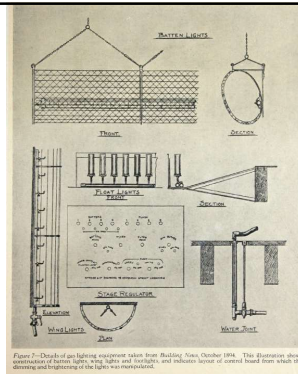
Detail of an lighting apparatus taken from Building from October 1884. This illustration shows connections of burner lights, wing lights and footlights, and indicates layout of control board from which the lighting and engineering in the light was regulated.
